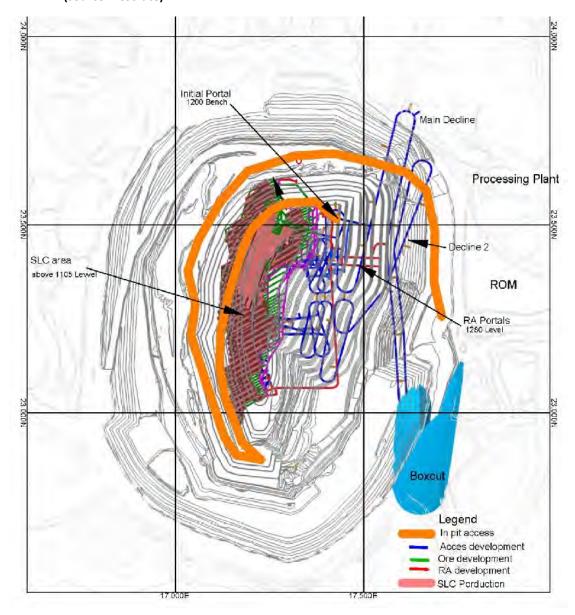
Plan view of the Syama Underground footprint showing access points and development (source: Resolute)
